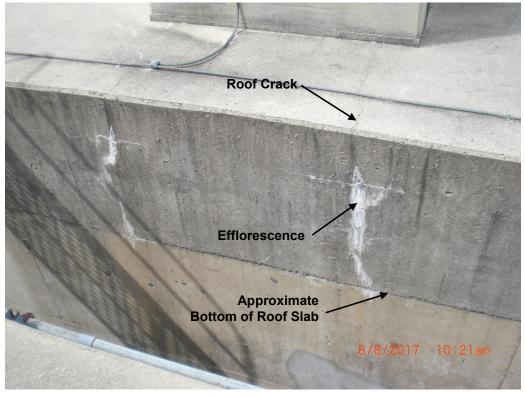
Roof Cracking Extending to Efflorescence on Walls
